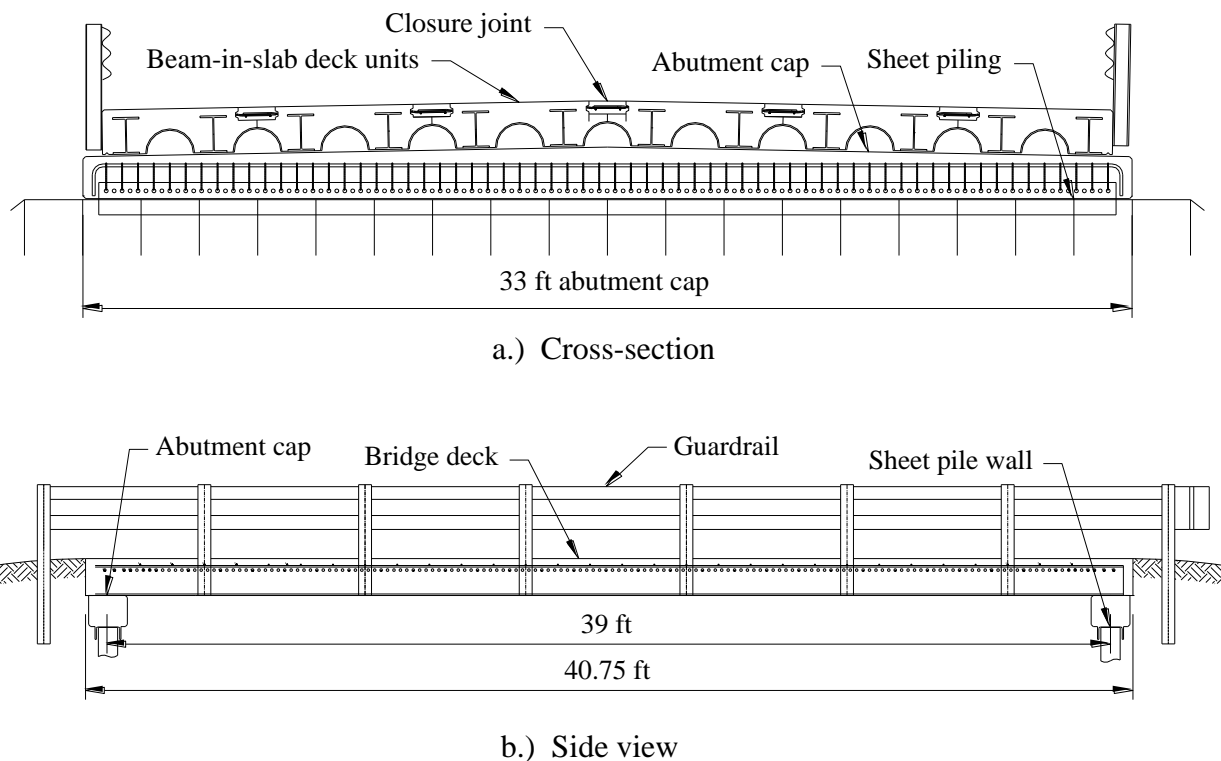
Replacement bridge deck and abutment elements for demonstration project in BHC, Iowa
